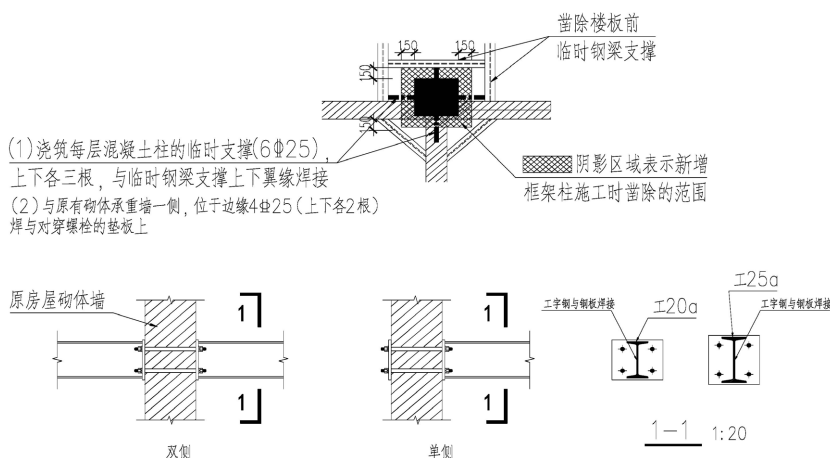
Schematic diagram of wall chiseling and temporary floor support
